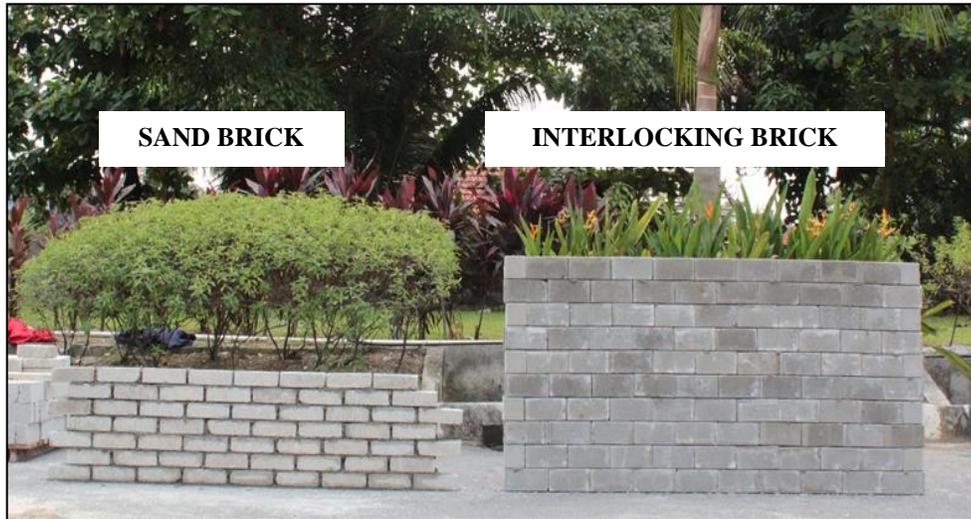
Construction progress for 2x1m of non-load bearing wall after completed observed in 73 minutes
